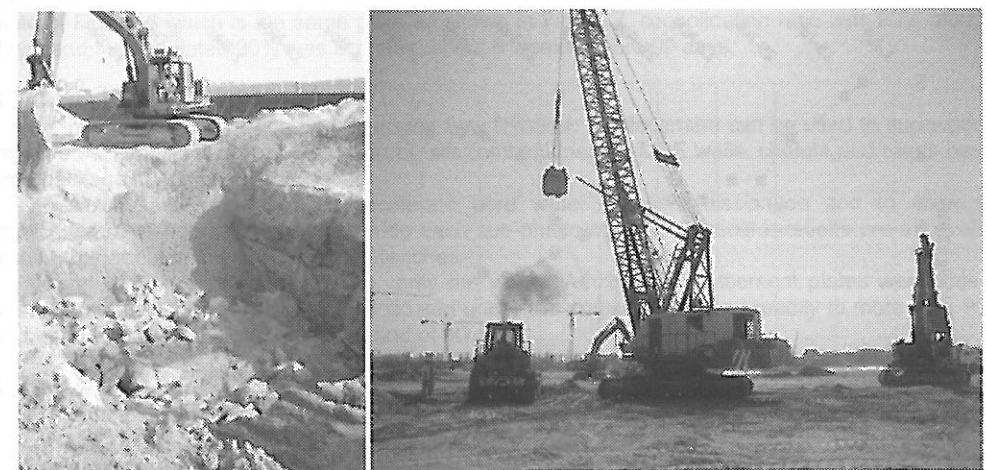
Excavation of DR trenches, backfilling with demolished concrete and sand, and execution of Dynamic Replacement
